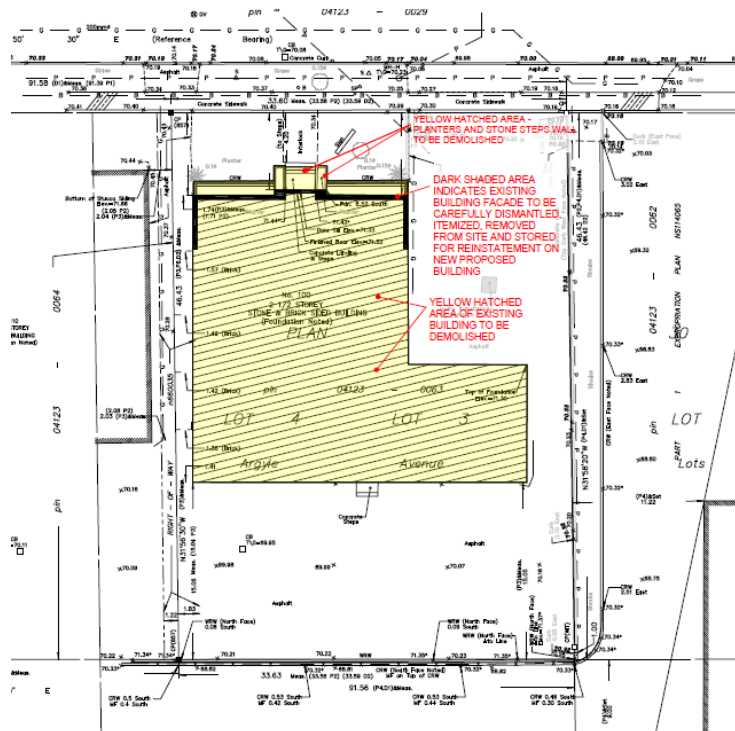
Survey Plan of the existing building indicating the portion of the building to be demolished shown in yellow hatch with the black outline indicating the front façade to be dismantled.
